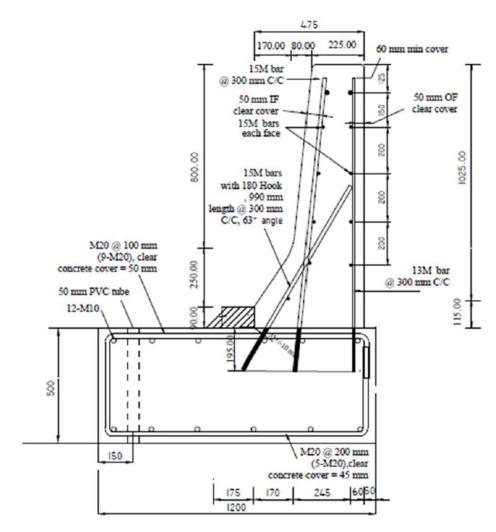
Barrier specimen B-5 details (Interior Location - No Cantilever - Post-Installed)
